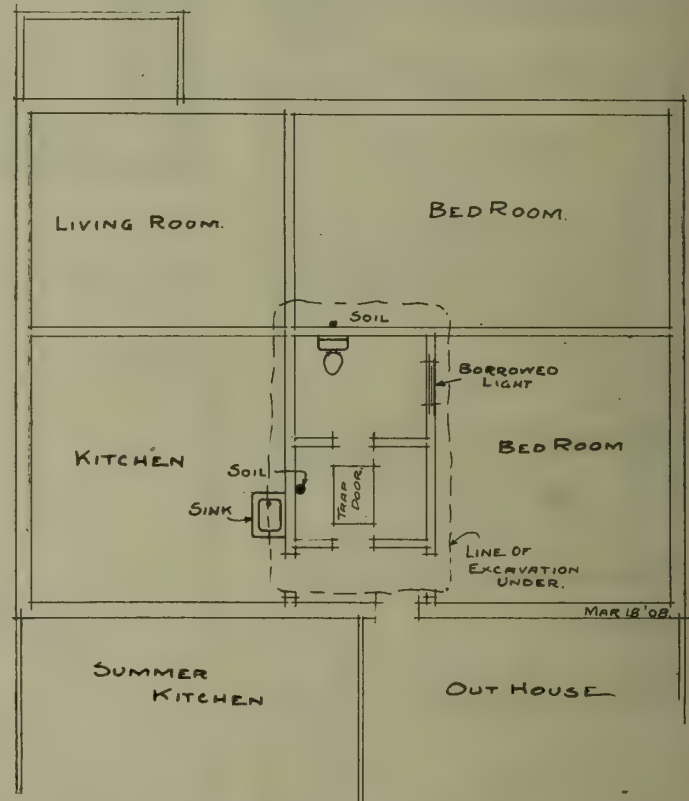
Floor Plan Showing Enclosed W.C. in Western Town.
